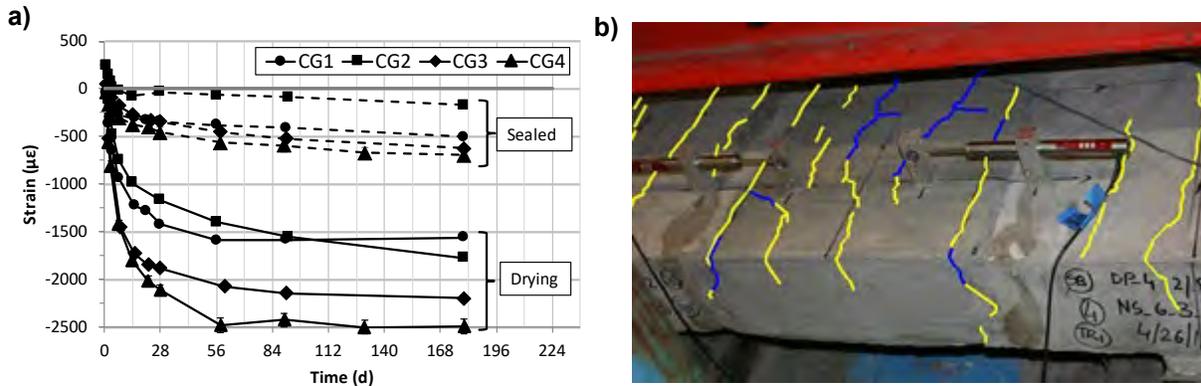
(a) Measured autogenous (sealed) and drying shrinkage of four commercially-available cementitious grouts (adapted from (4)), (b), Grout-concrete connection showing shrinkage cracks (blue lines) and mechanical loading cracks (yellow lines) (6).
